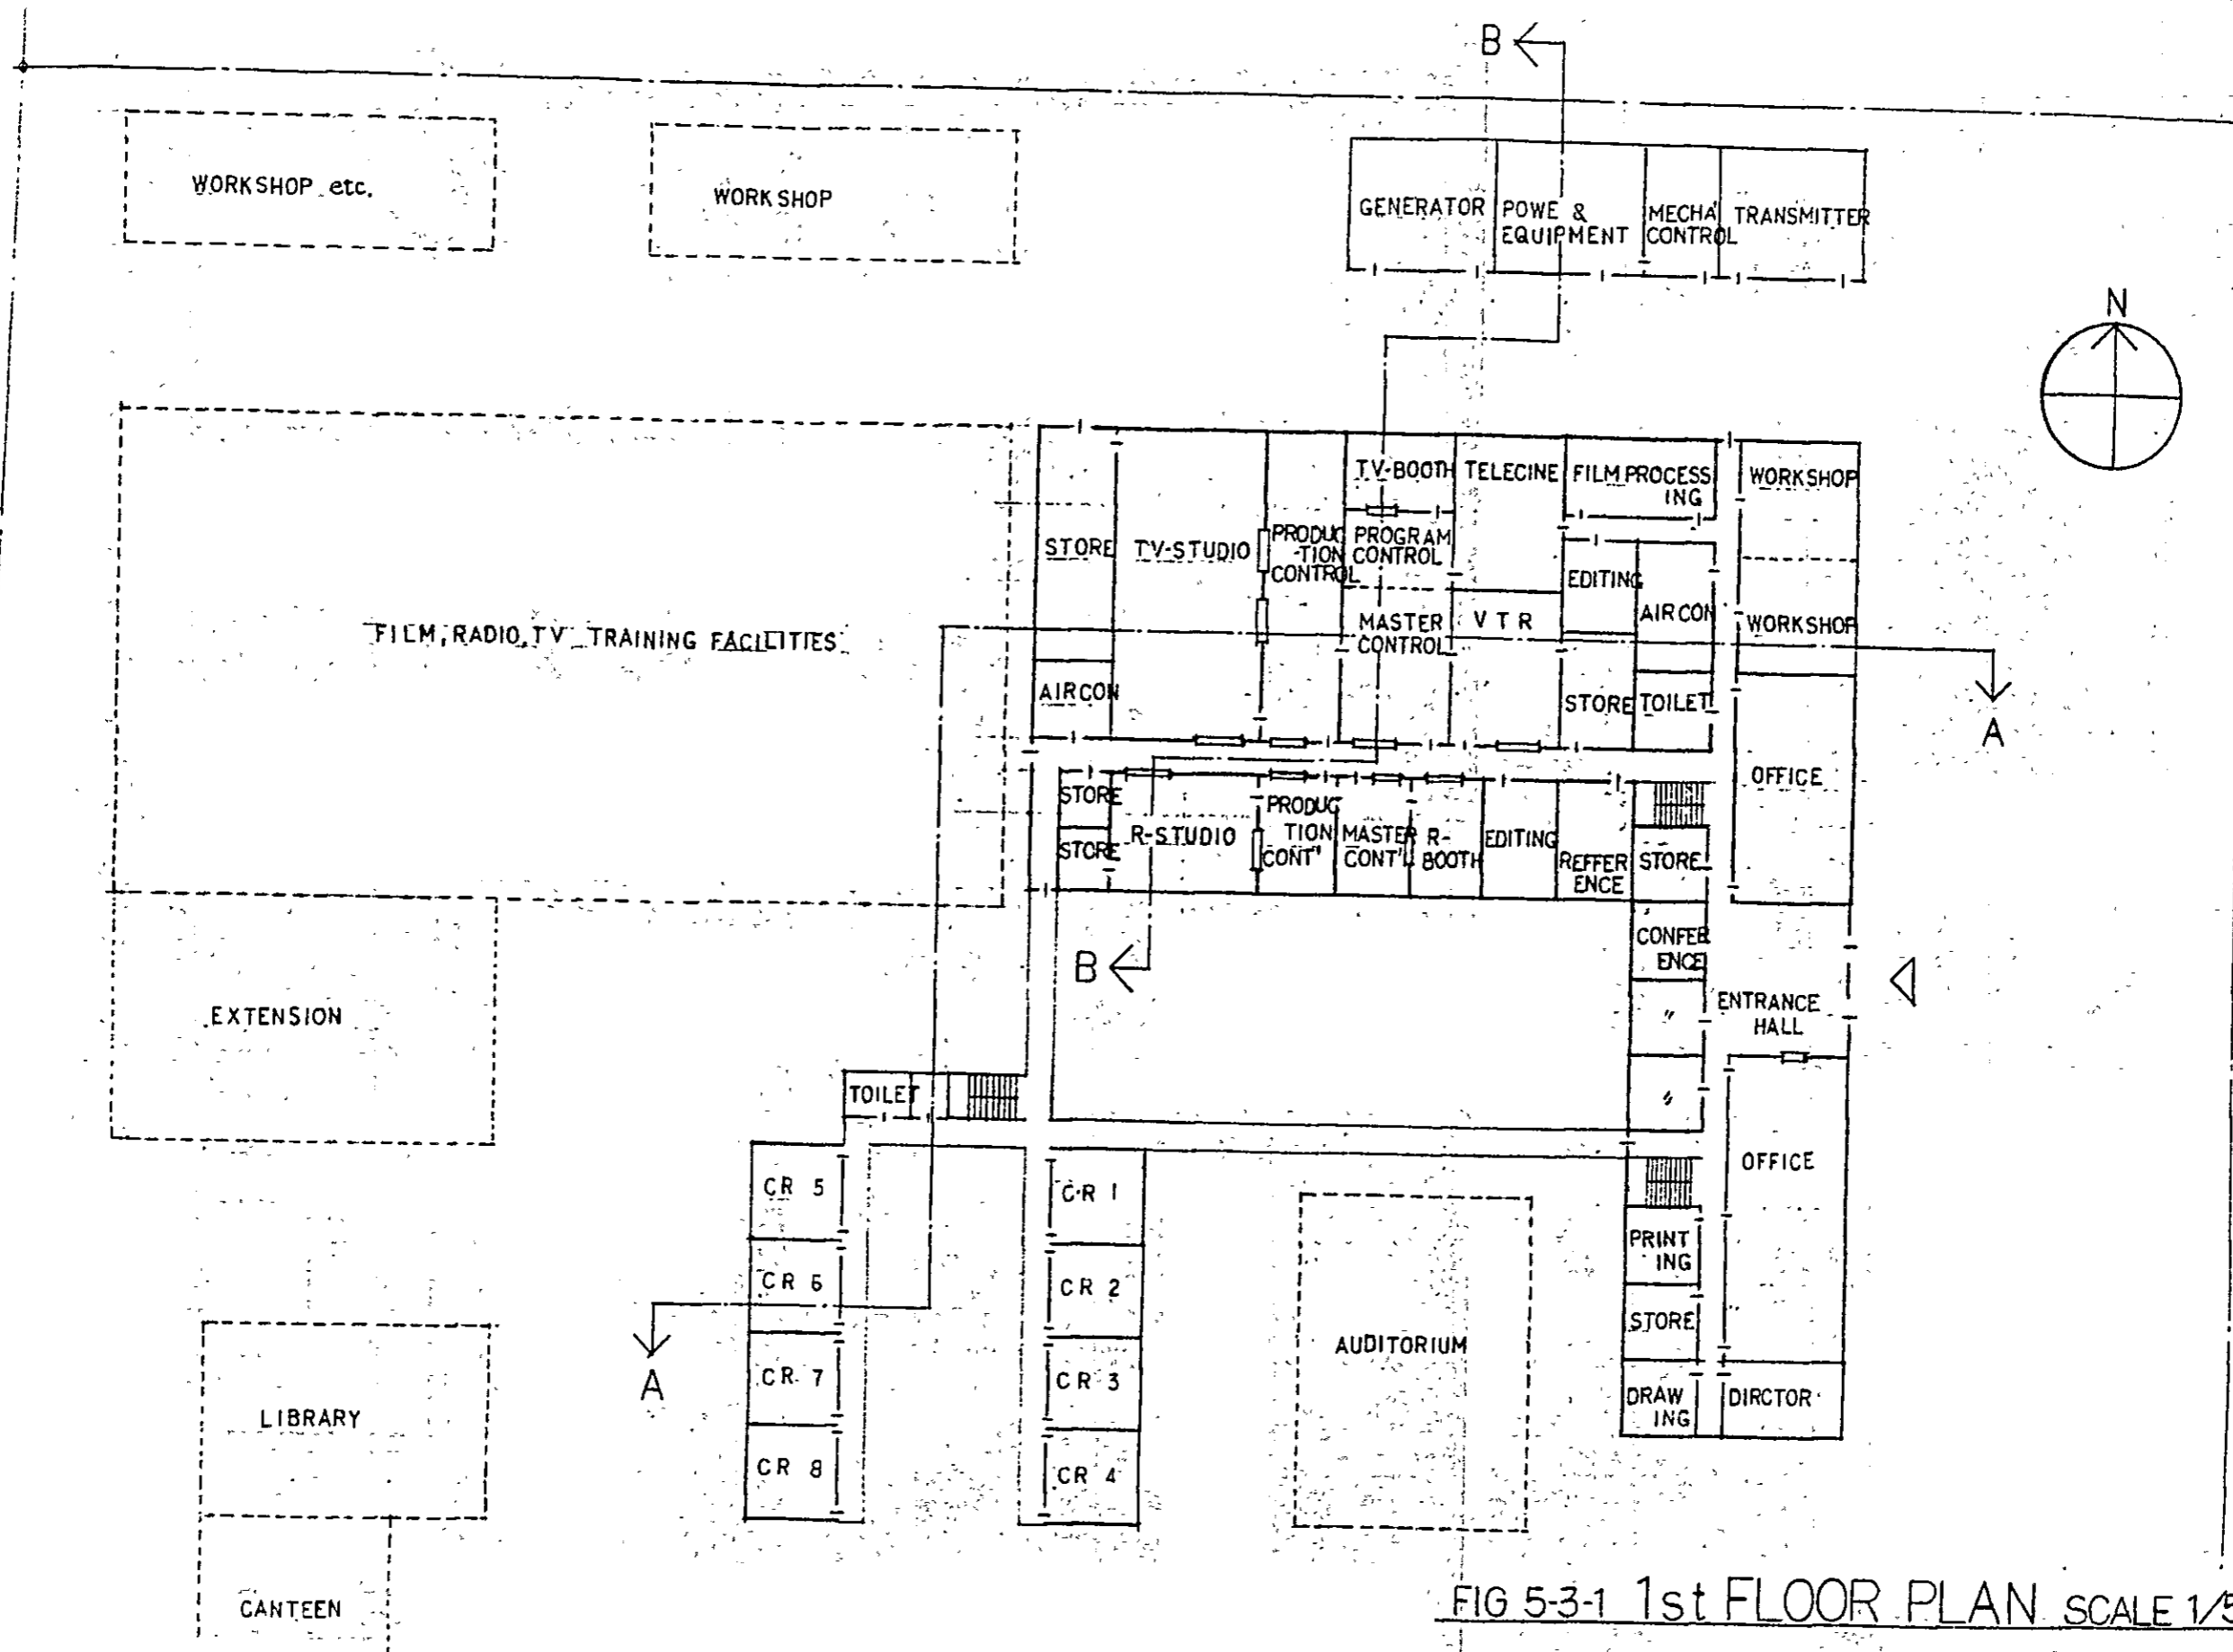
1st FLOOR PLAN SCALE 1/500
